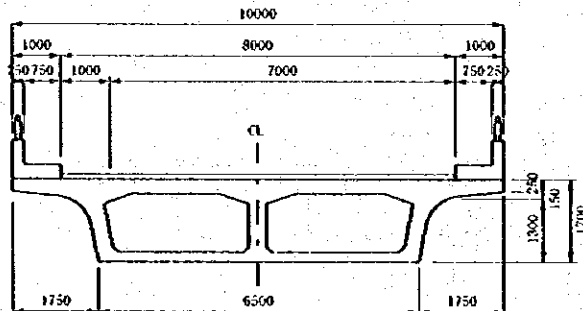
Cross-sectional Details of Super-structure Type 4 Girder For Aqr R/A
